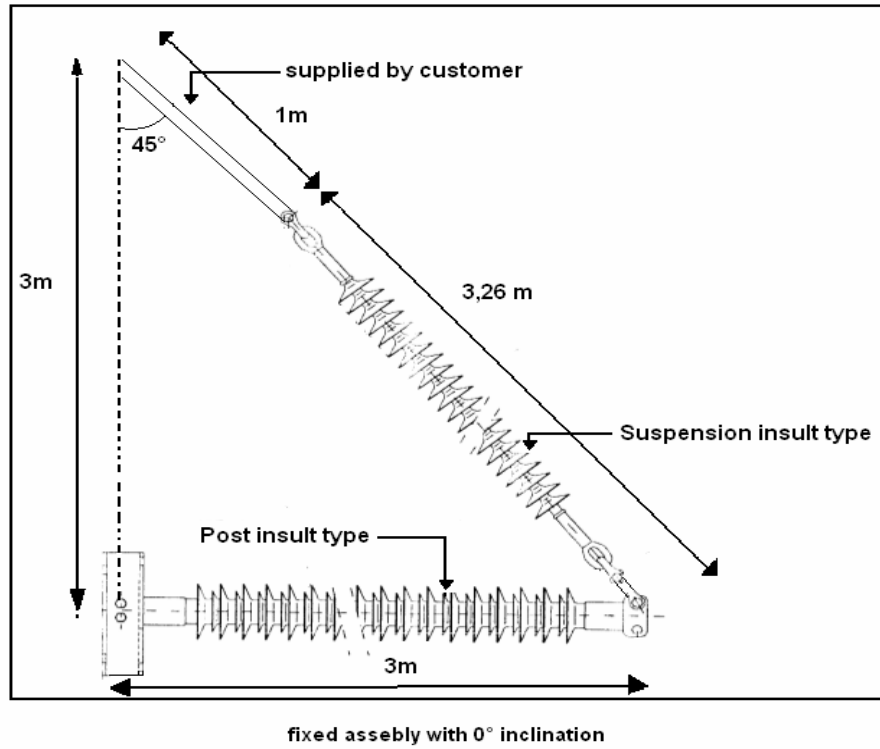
Fixed assembly with 0° inclination pour 400KV
